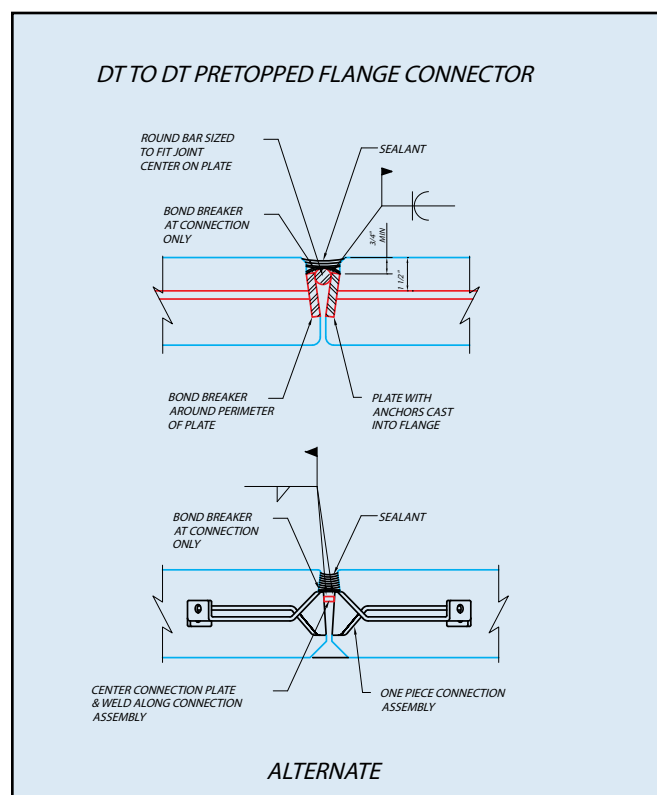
Double tee to double tee pretopped flange connector. Note: " = 1 in.; 1 in. = 25.4 mm.
